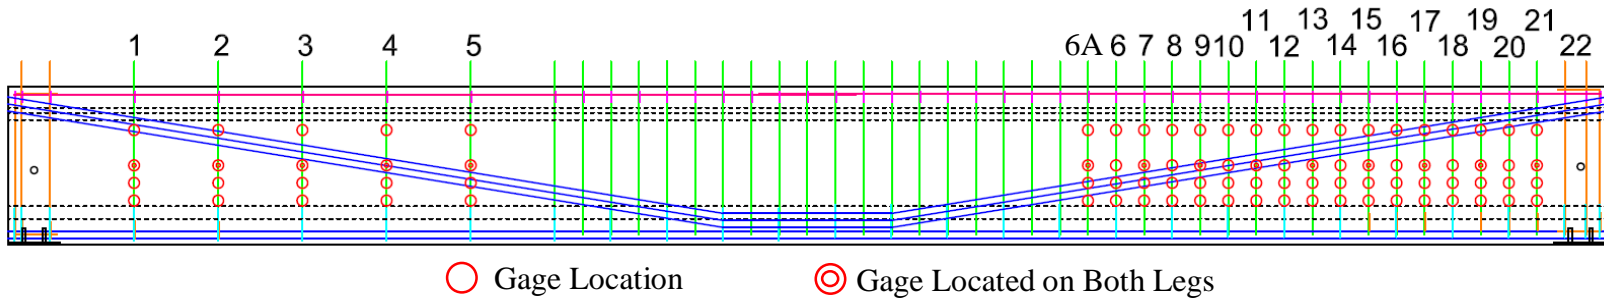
Elevation view of strain gage locations for the 45M prestressed concrete girder.
